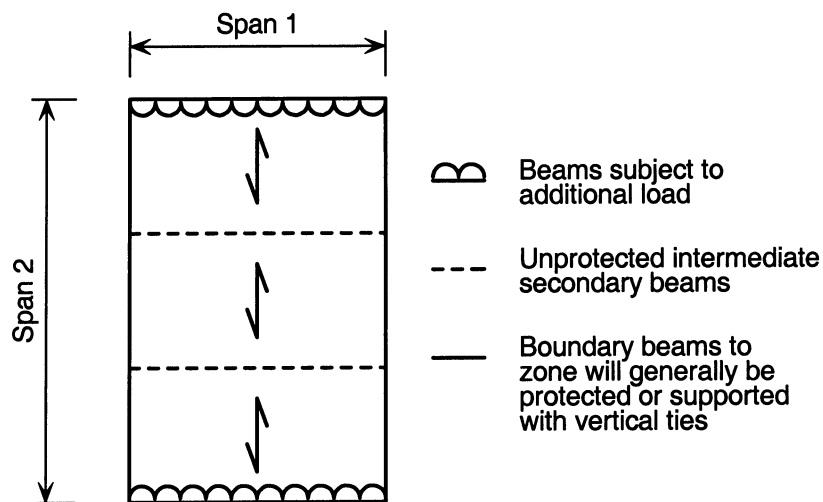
Definition of span 1 and span 2 and beam lay out
